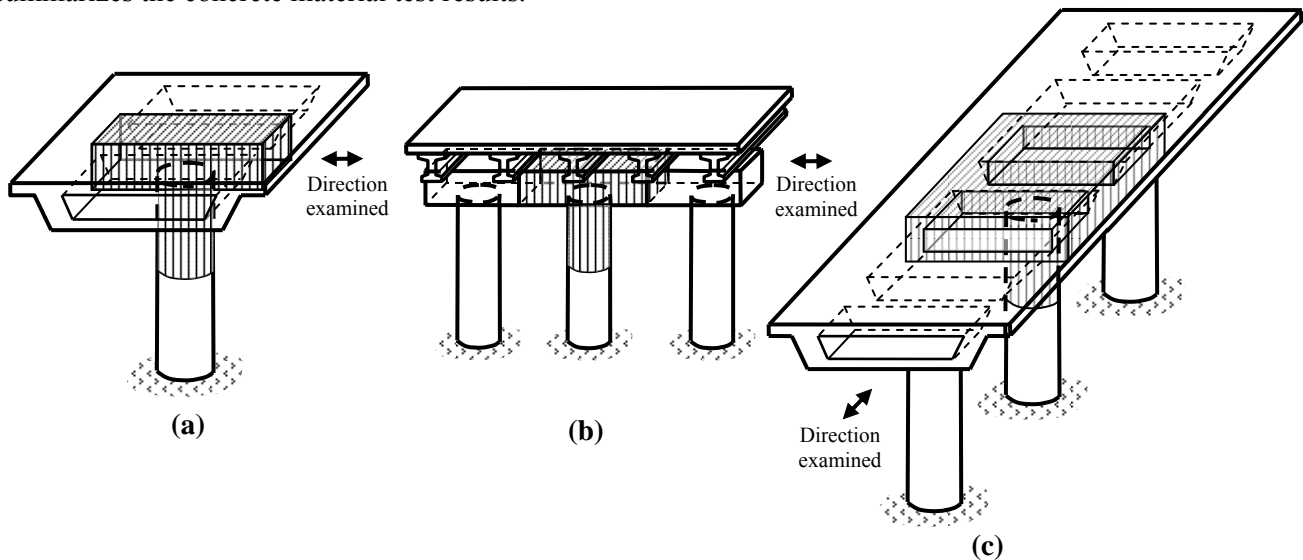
Type of joints: (a) between single column pier and single box superstructure in the direction perpendicular to bridge axis (A1 to A4 specimens), (b) between interior column and cap-beam of a three-column bent (specimens A1 to A4) and (c) between single column pier and single box superstructure in the direction along bridge axis (A5 and A6 specimens).
